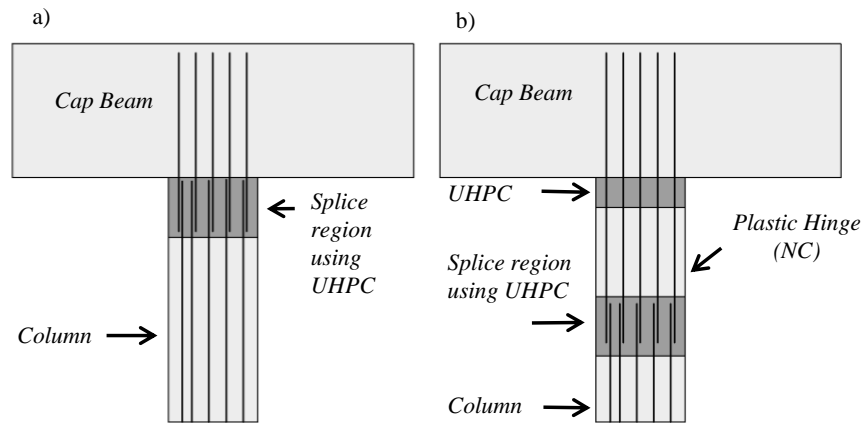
Details of the concept of the proposed connection a) Detail 1 b) Detail 2.
